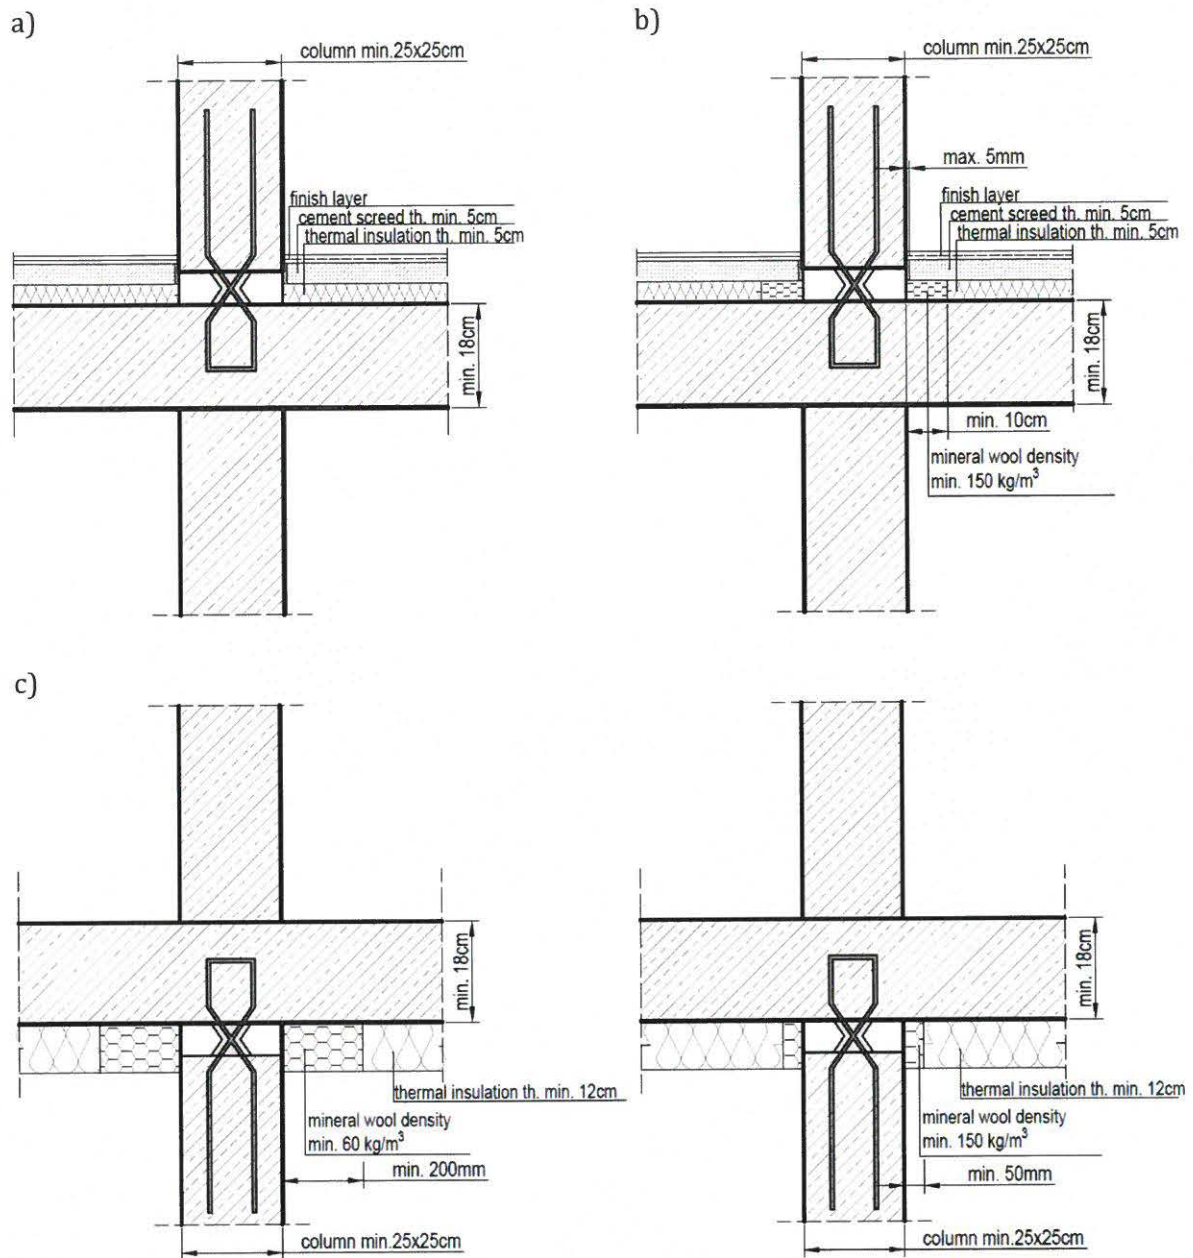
Column and floor/flat roof connection with Schöck Alphadock / Sconnex Typ W
